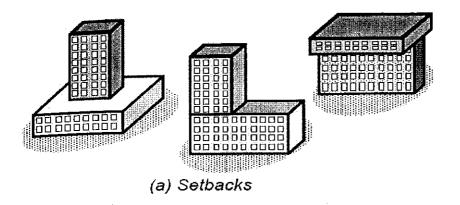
Effect of Vertical Layout of the Building on Earthquake Damage
